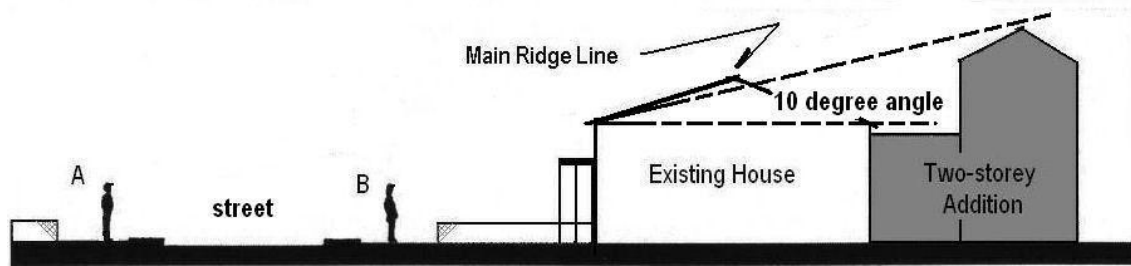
Side view of a two-storey addition to a single storey dwelling may be partially visible in distant views (eg to person A) but should be contained within a 10° building envelope established from the front of the dwelling and using the gutter line as the base line. The addition should be almost wholly invisible to person B.
